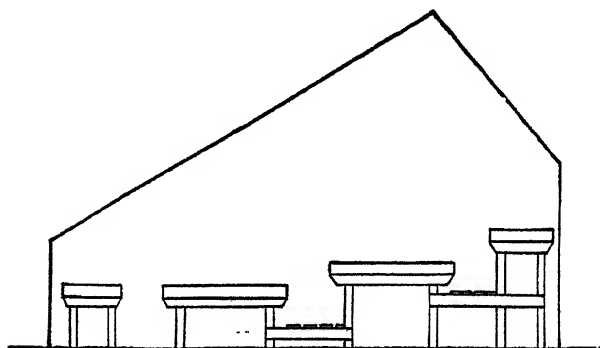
Method of arranging benches in an uneven-span house to secure best advantage of the sunlight.
